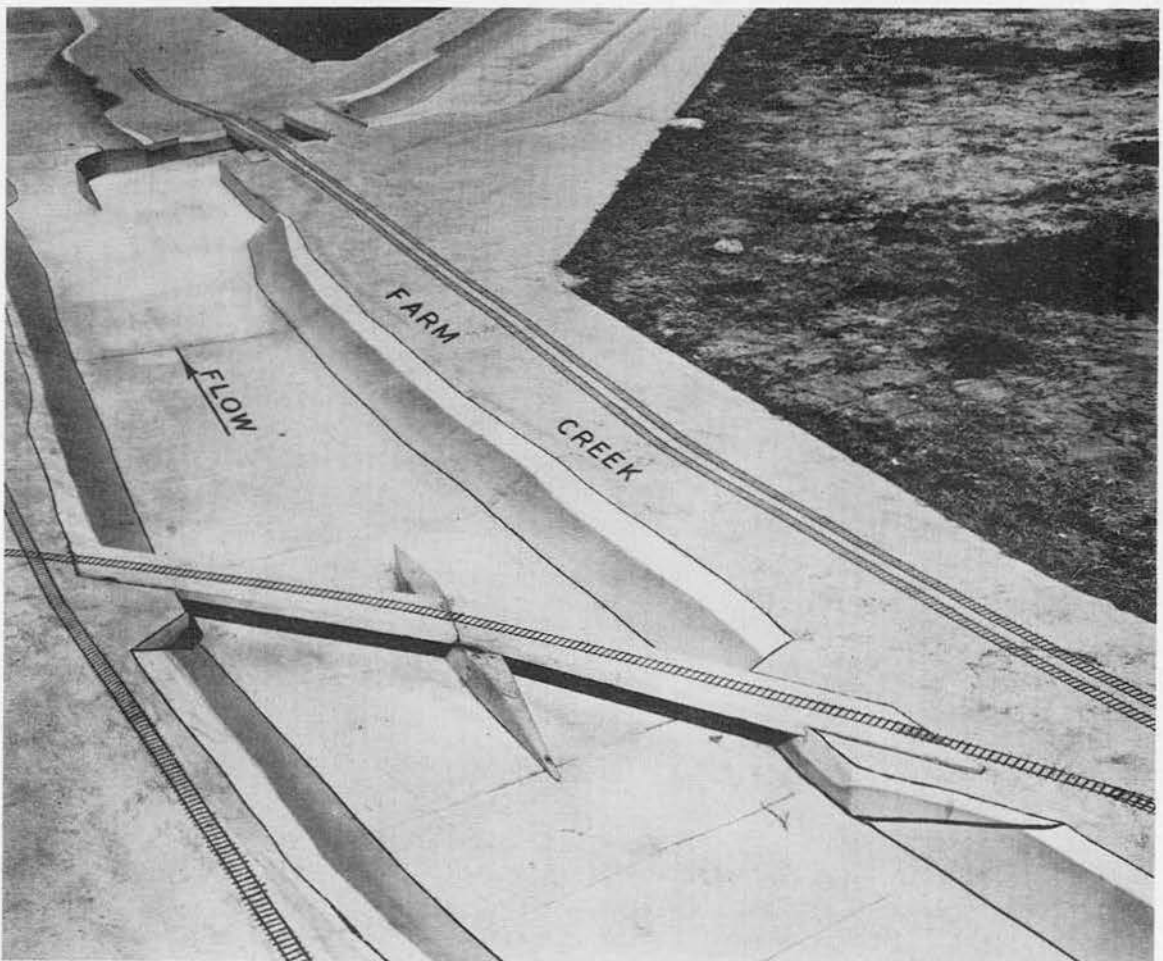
Final pier and abutment plan for Peoria and Pekin Union Railroad bridge
